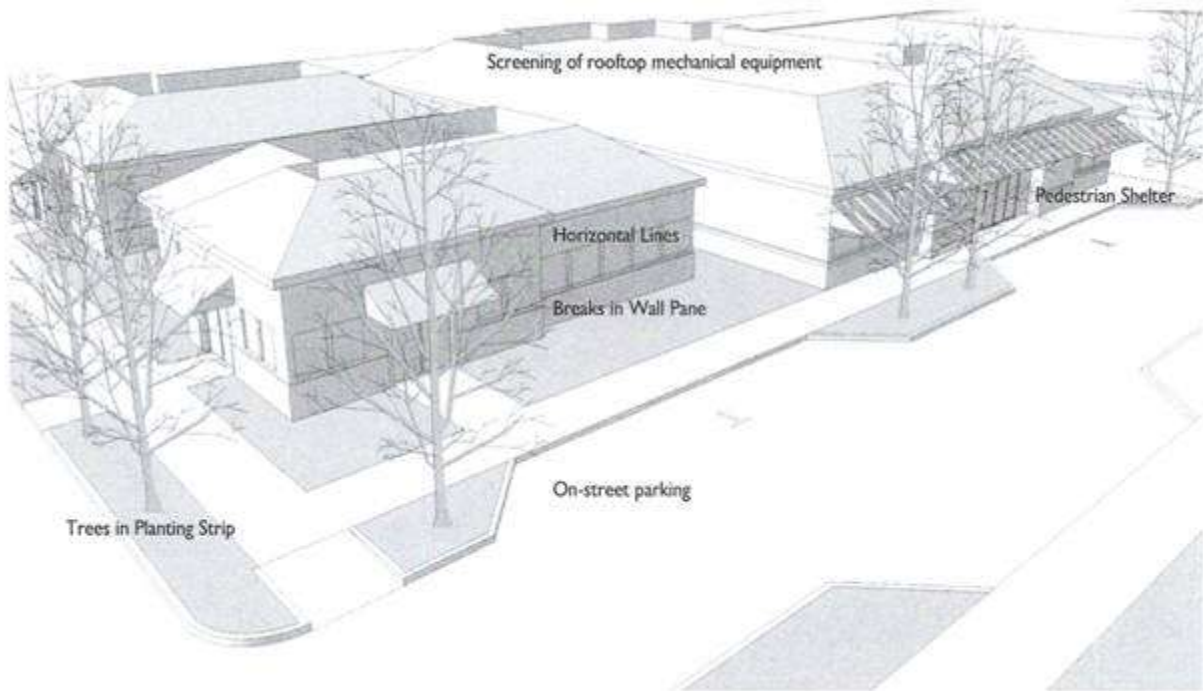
Articulation of Single-Story Buildings and Typical Pedestrian Shelters
